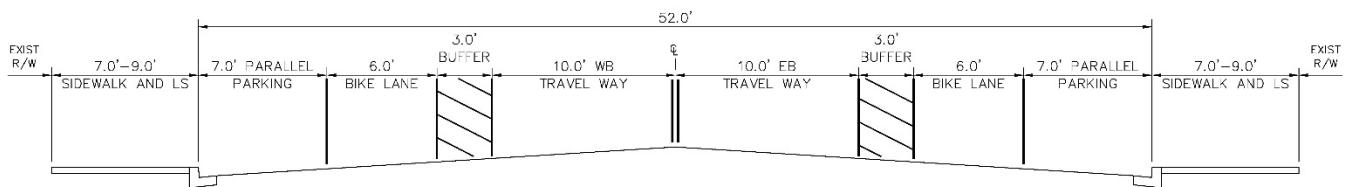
Robinson Avenue Cross-Section (Georgia Street to Florida Street (Class II))
